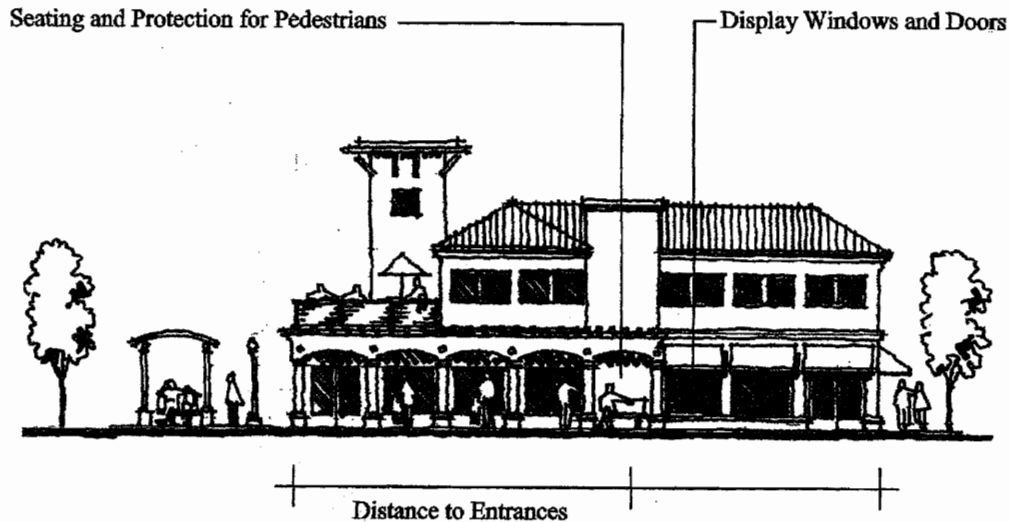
B(1) - Commercial Building Design Elements (Typical)
